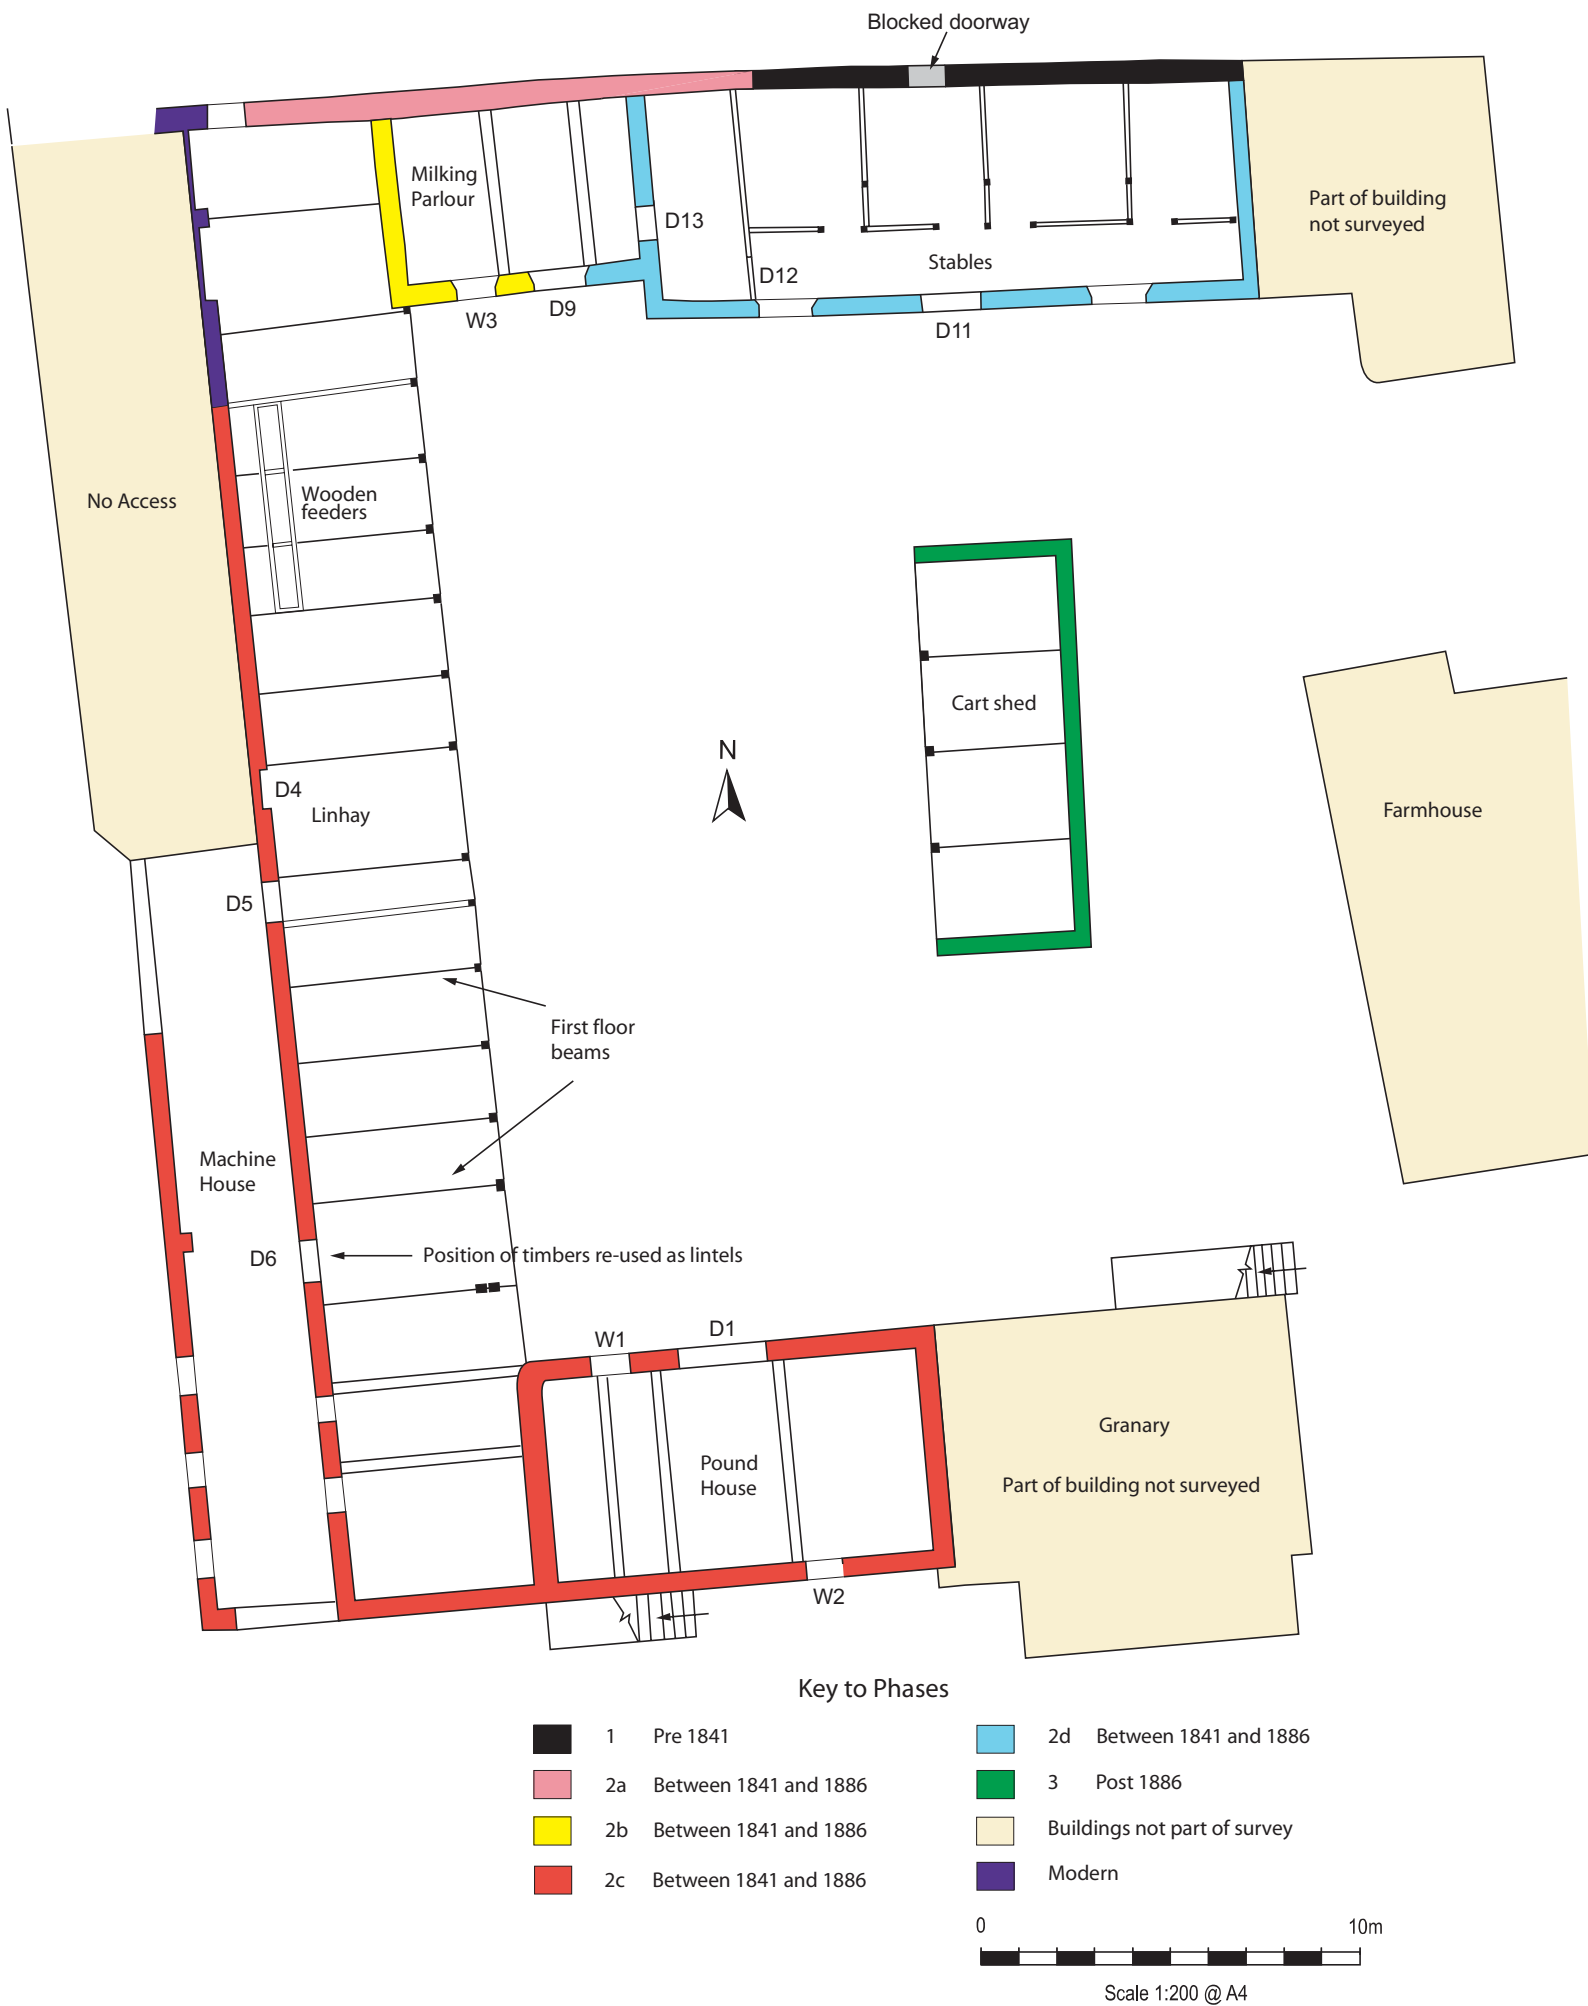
Knowle Farm outbuildings, ground floor plan showing building phasing.
